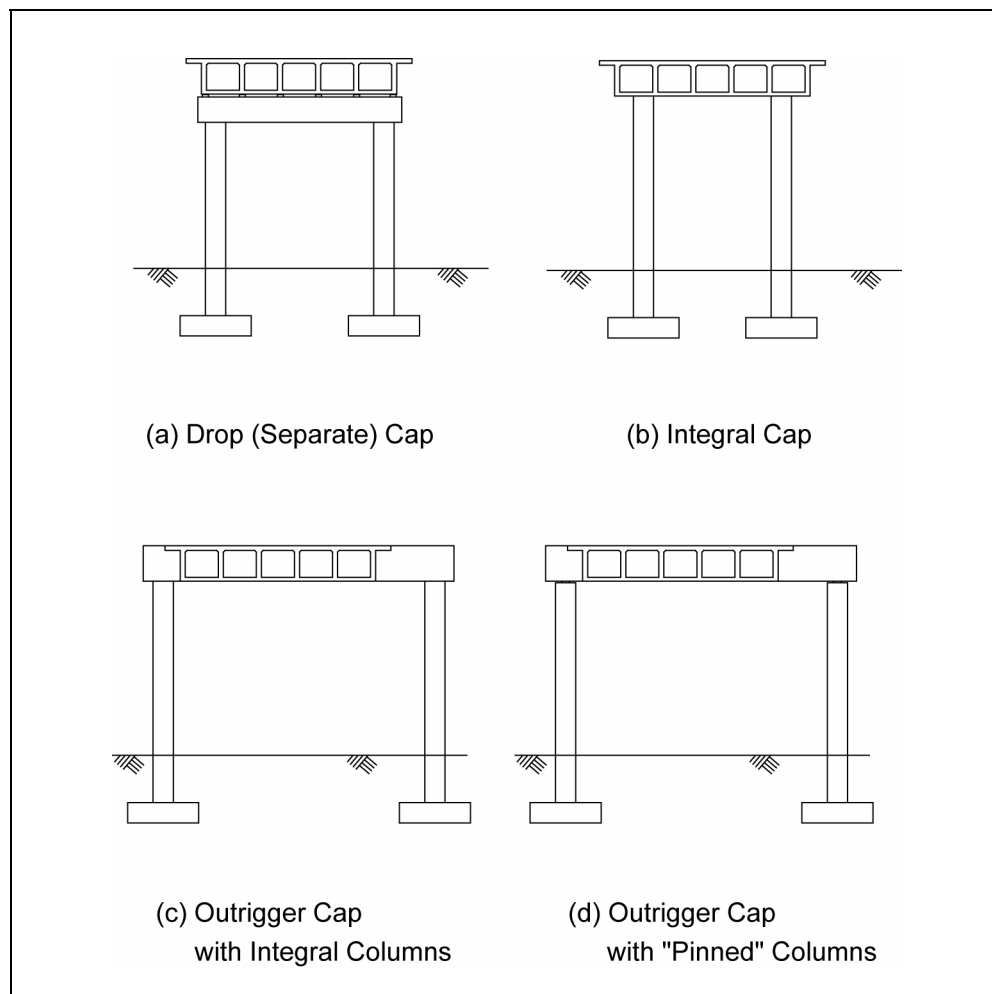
Typical cap beam configurations for boxgirder bridges.
